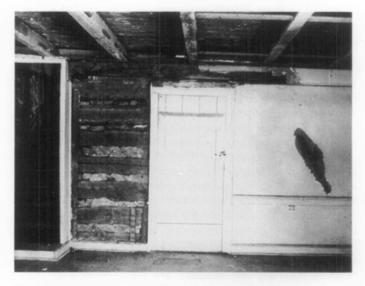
This photograph of the interior of a 1793 log house in Maryland reveals much about historic log building construction and interior finish treatments. To the left of the plank door plaster has been removed exposing the stone chinking and daubing; remnants of vertical furring strips attached to the logs show evidence of traditional horizontal lath, while the hole broken through the plaster wall on the right shows the use of diagonal lath. The open door reveals a very steep, enclosed stairway typical of many early log houses. Although plaster has been removed from the ceiling, the wall to the right of the door shows the original plaster finish and fine woodwork including beaded chair rail, floor and door molding. Photo: National Park Service Files.
